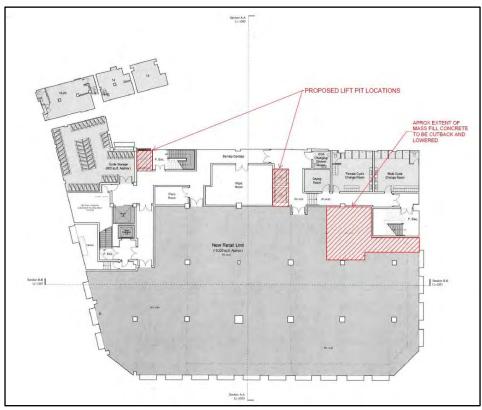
Proposed location of new lift pits (Webb Yates Engineers Ltd 2019)
